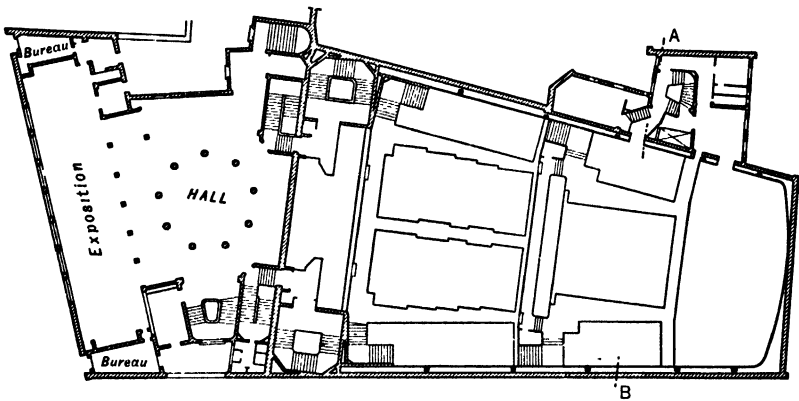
Plan of Salle Pleyel, showing the divergence of the side walls.
